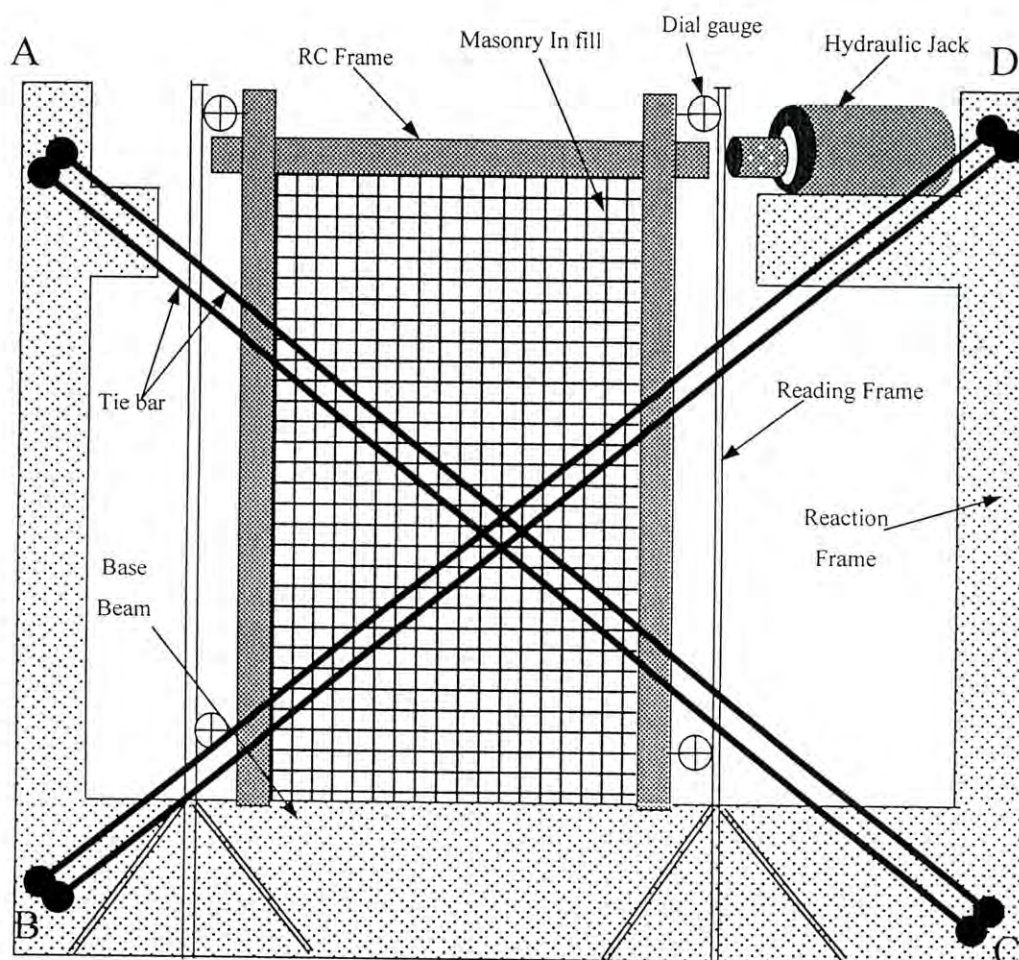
Schematic elevation of Masonry infilled RC Frame and test setup.
